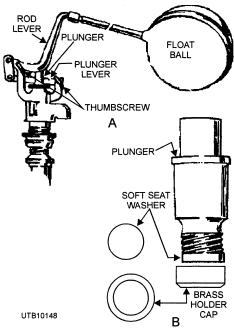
A. Ball cock assembled; B. Plunger washer and cap.
